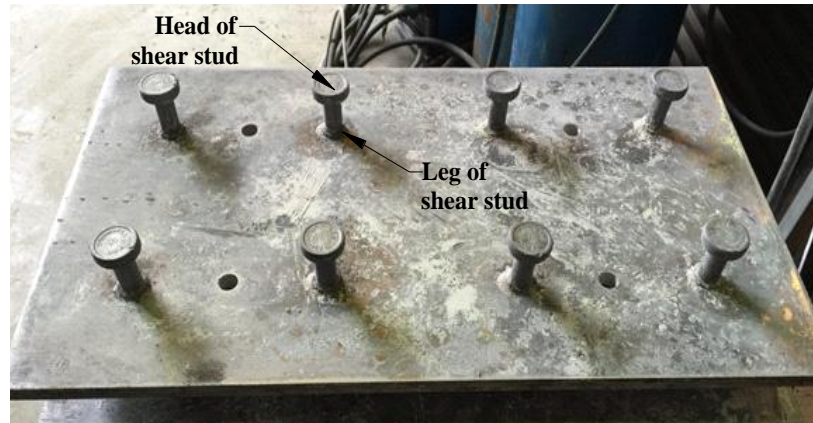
Pull-off test steel plate with welded shear studs
